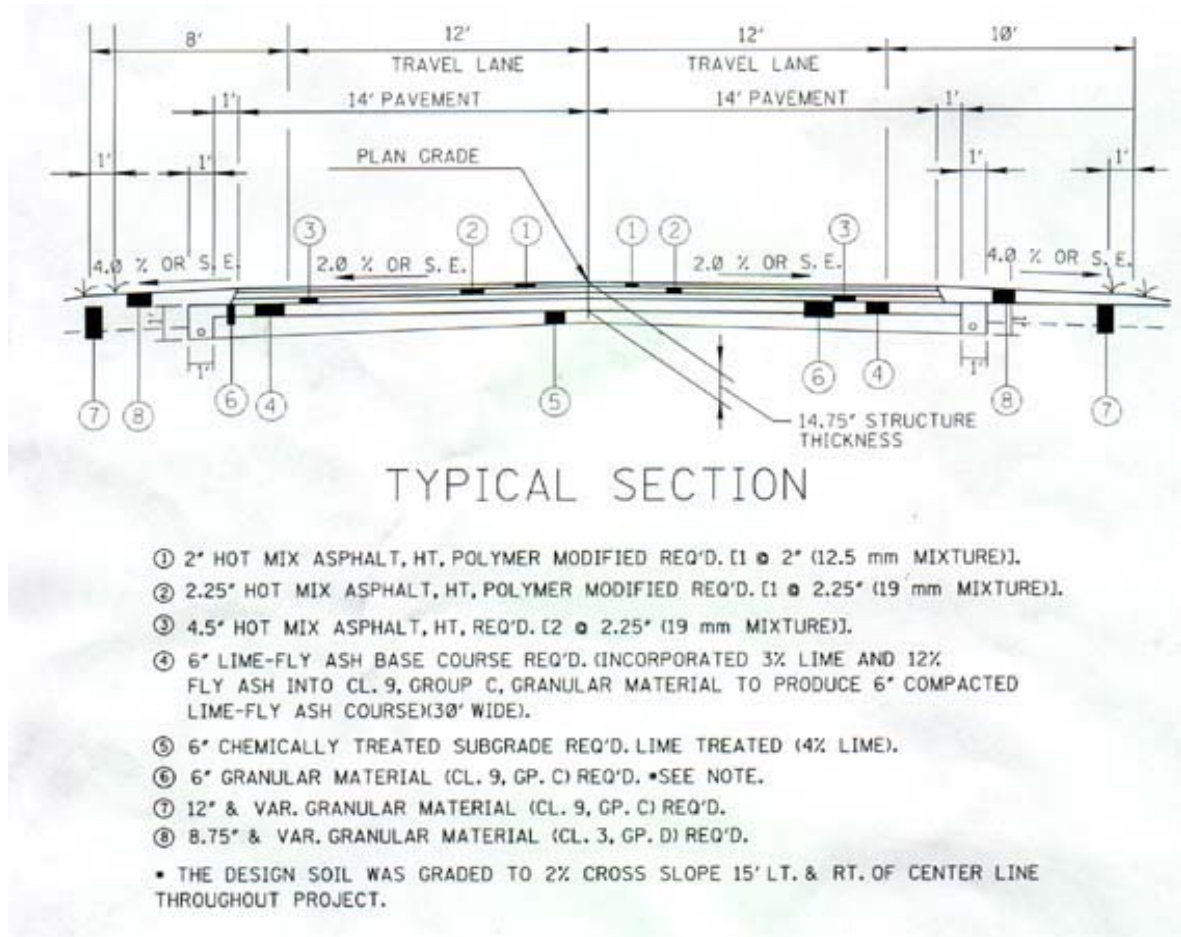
Typical Test Section X-Section, Mississippi Highway #302, Marshall County
